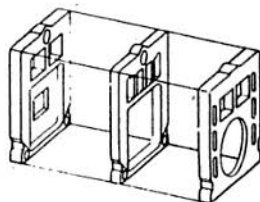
Assembling vertical sectional cast-iron boiler of push-nipple type.
